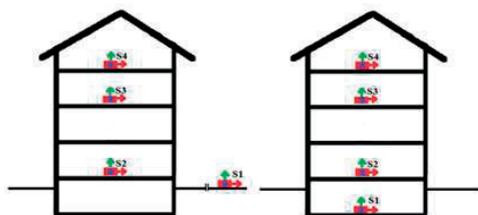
Location schemes of the 4 triaxial sensors. Scheme 1 (left): sensors located on the ground floor, 2nd floor, 3rd floor and near the building. Scheme 2 (right): sensors located on the basement, ground floor, 2nd floor and 3rd floor
